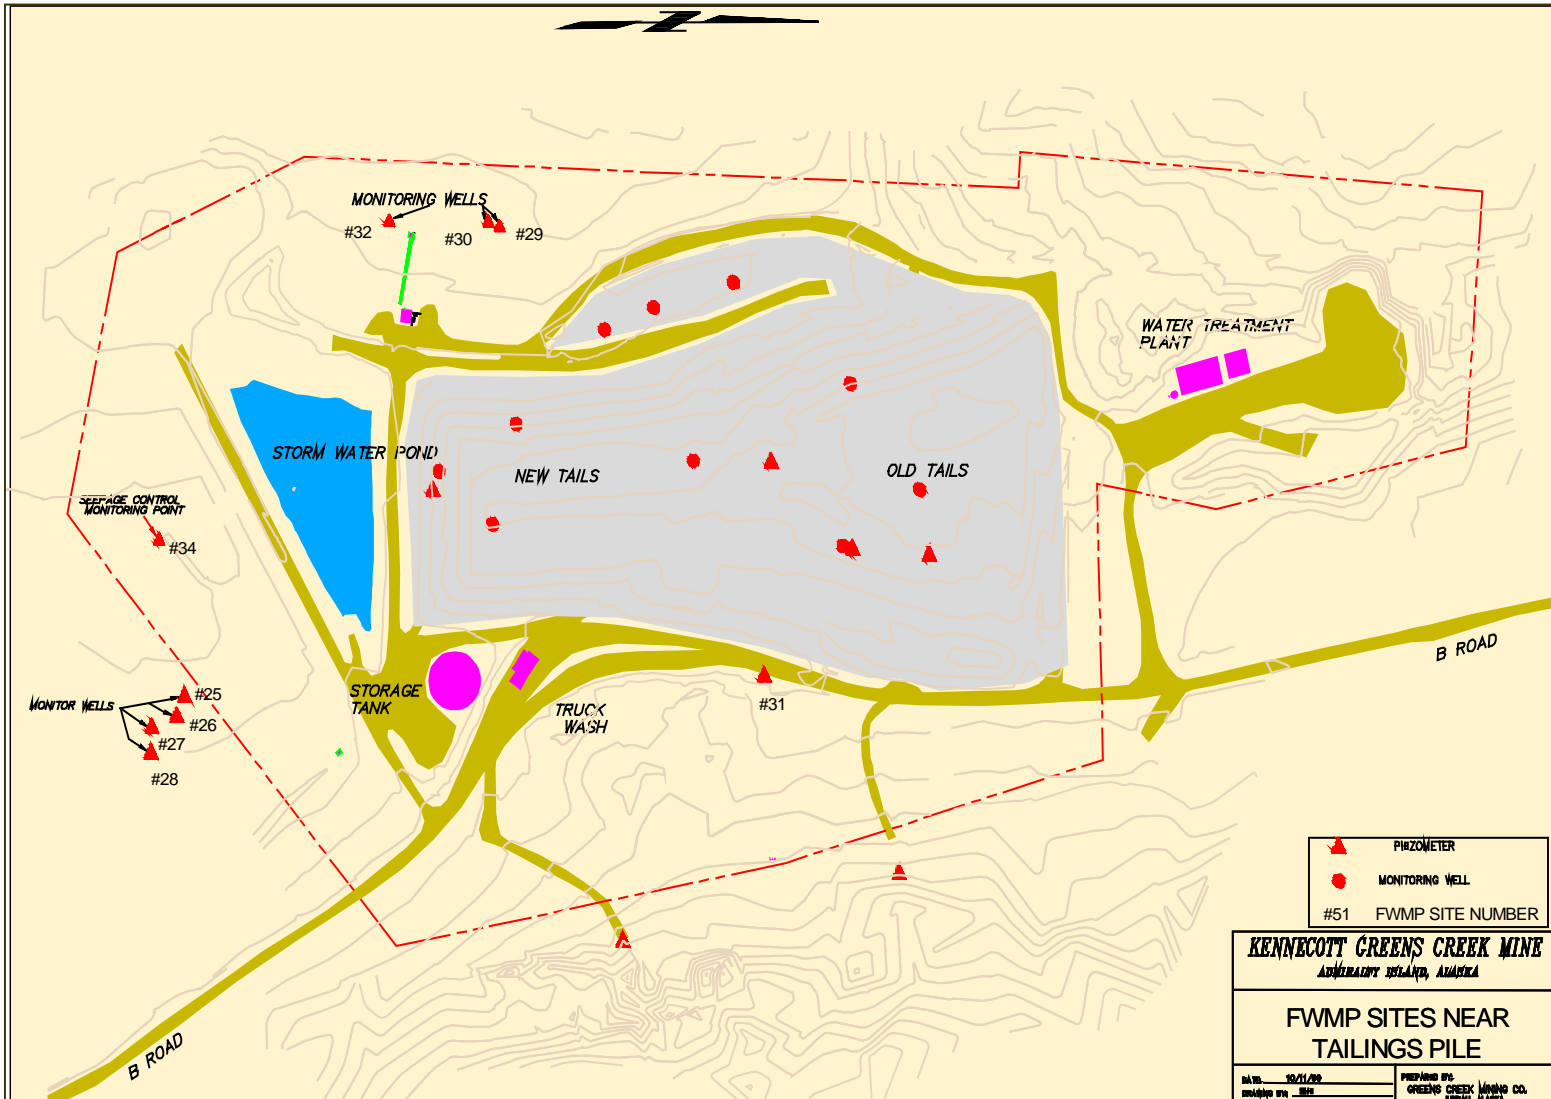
Layout of the Dry Tailings Facility at the Kennecott Greens Creek Mine
